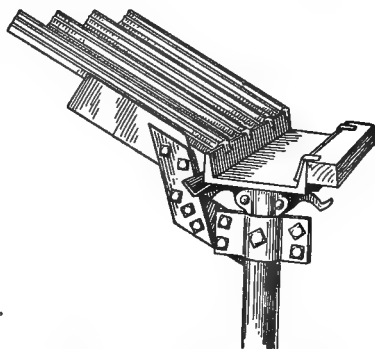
Iron gutter with roof bars connected. Also shows connection with iron post.
